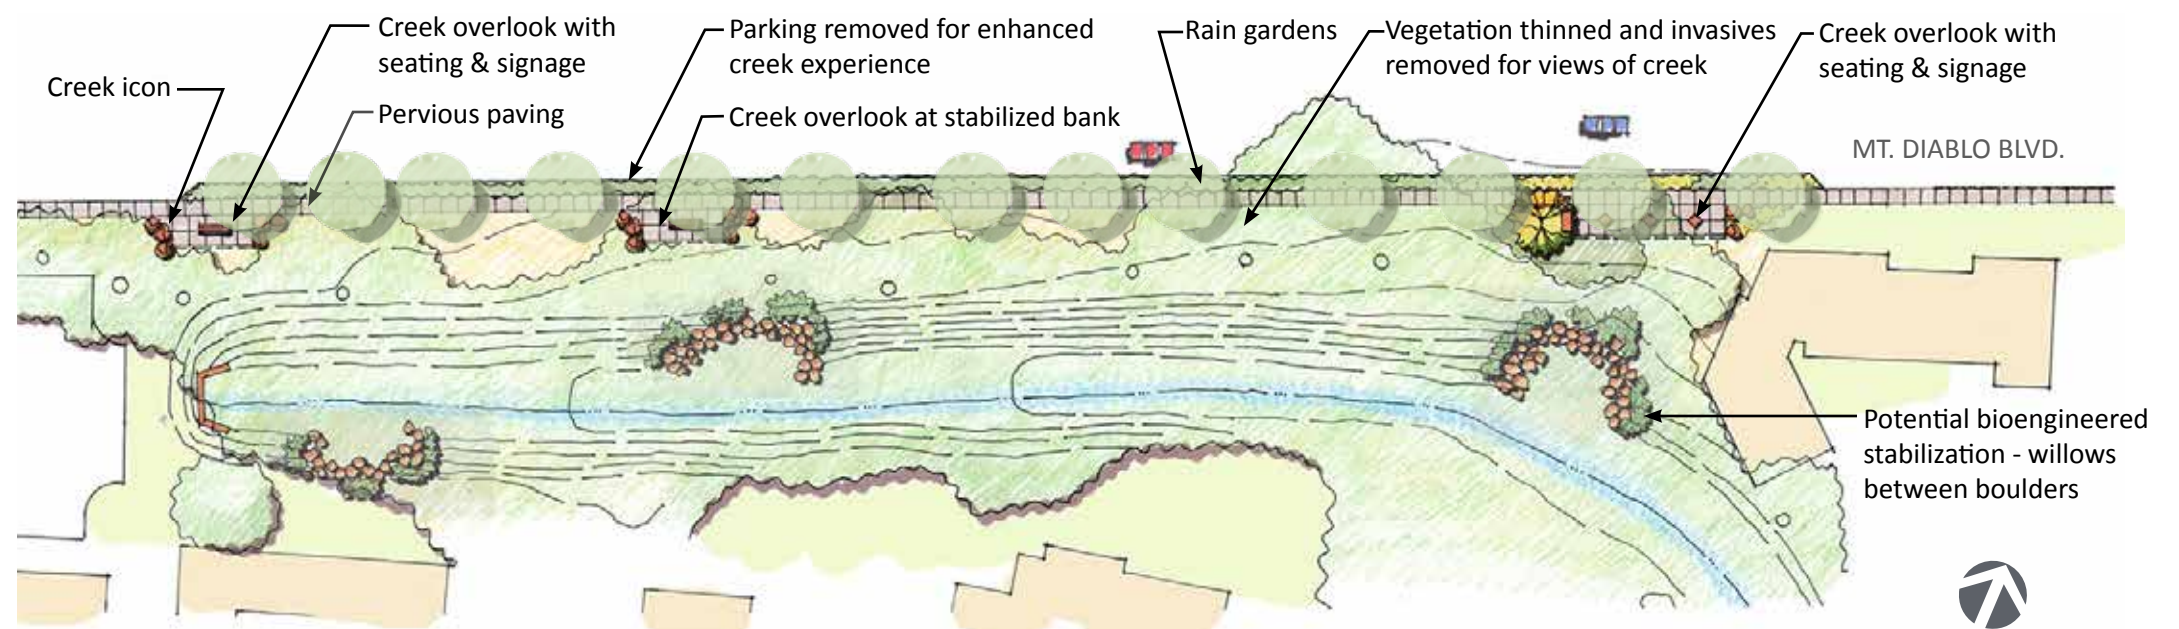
Plan view - Creek overlooks, rain gardens and pervious paving
